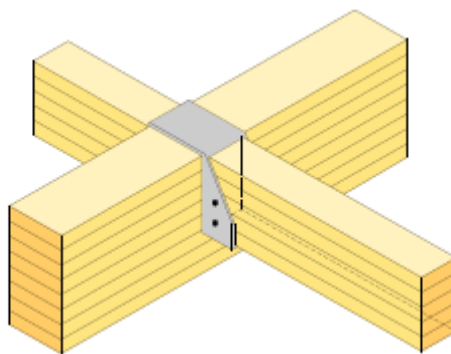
Beam-to-beam connection with an overhanging beam shoe
